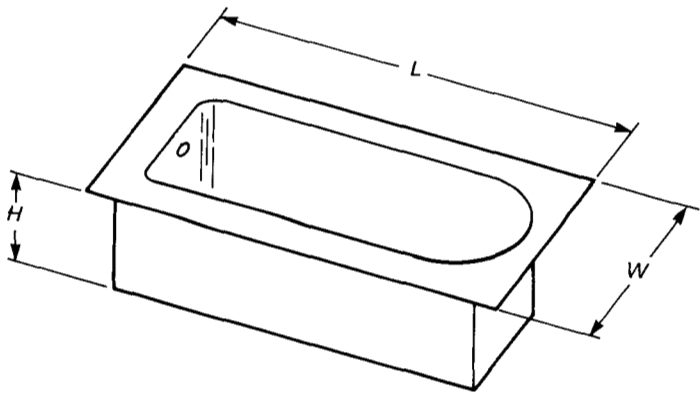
RECESS BATHTUBS, 16 in. HEIGHT,
